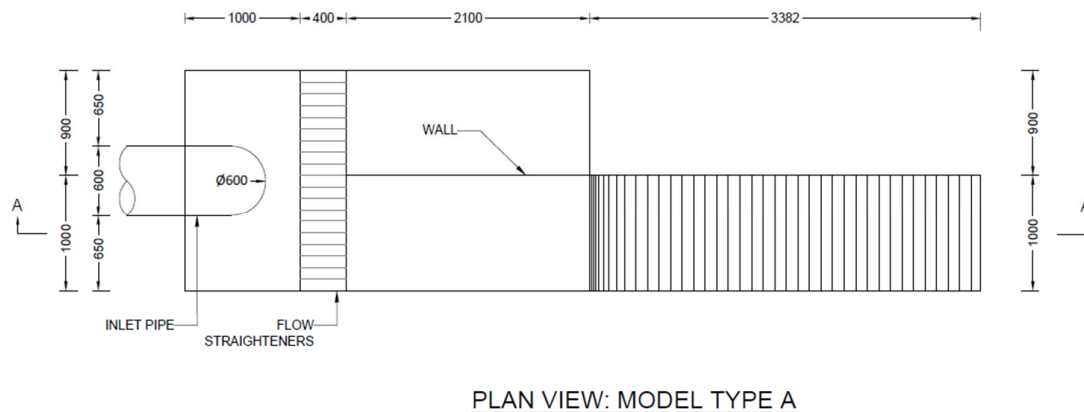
Plan view of spillway model (i.e. representation of the spillway centre)
